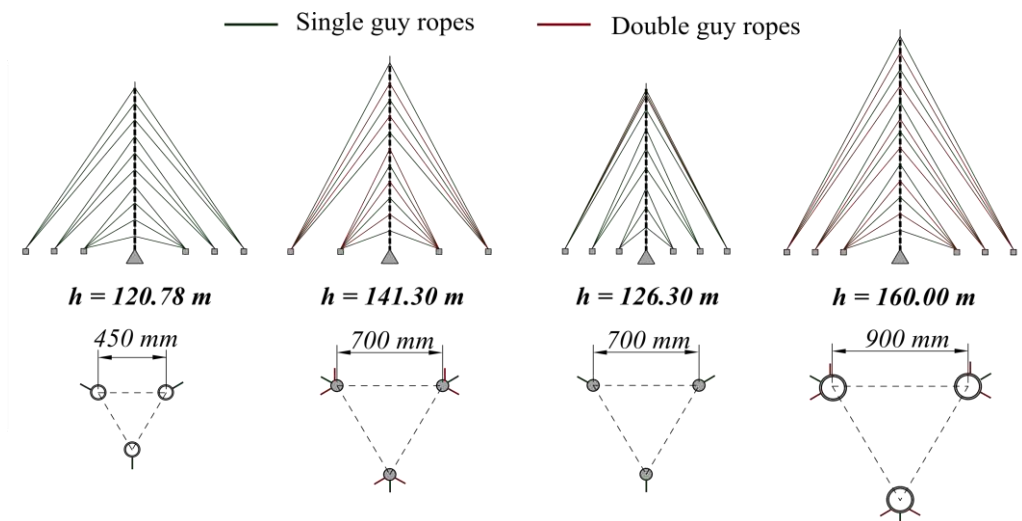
Schematic layout and cross-sections of the considered mast structures
